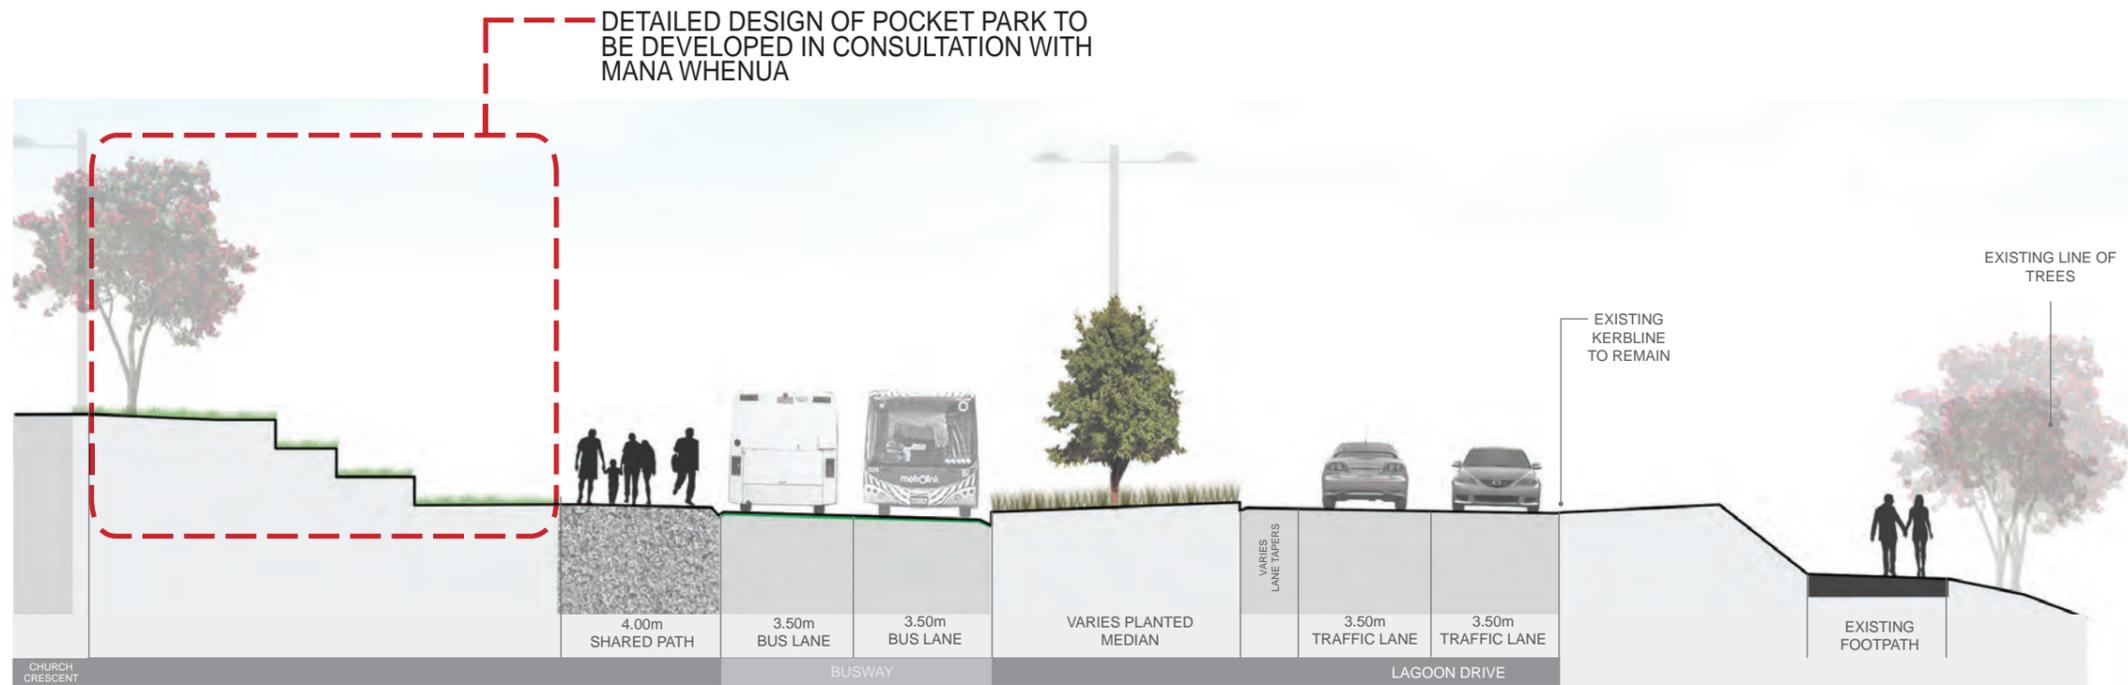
Section F-F through the new terraced pocket park at the intersection of Church Crescent and Lagoon Drive
